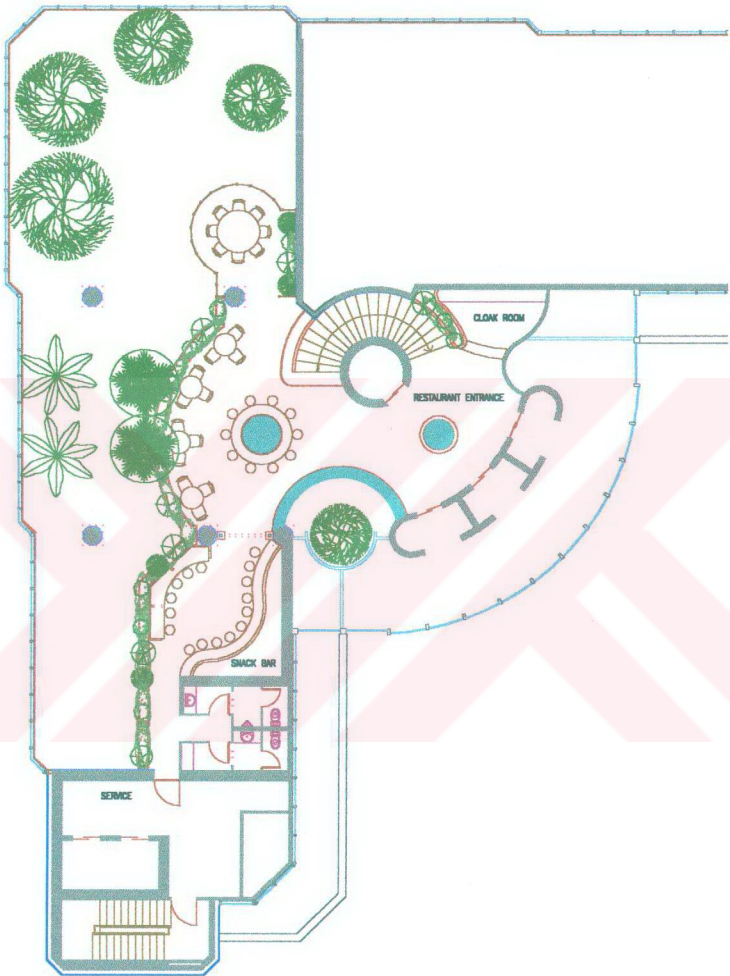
Bar level plan showing water features, plants & seating arrangements
